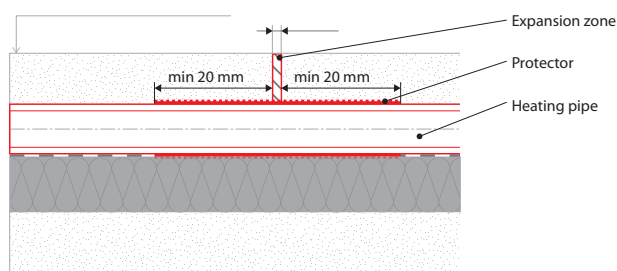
Expansion joint of heating screed when laying soft floor coverings (PVC, linoleum, carpet)
